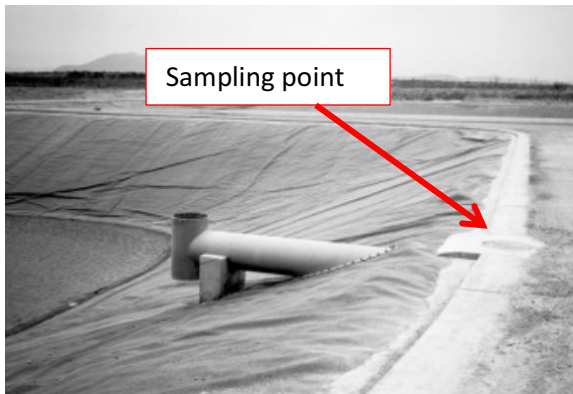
Schematic of a T-pipe outlet for a facultative pond.
